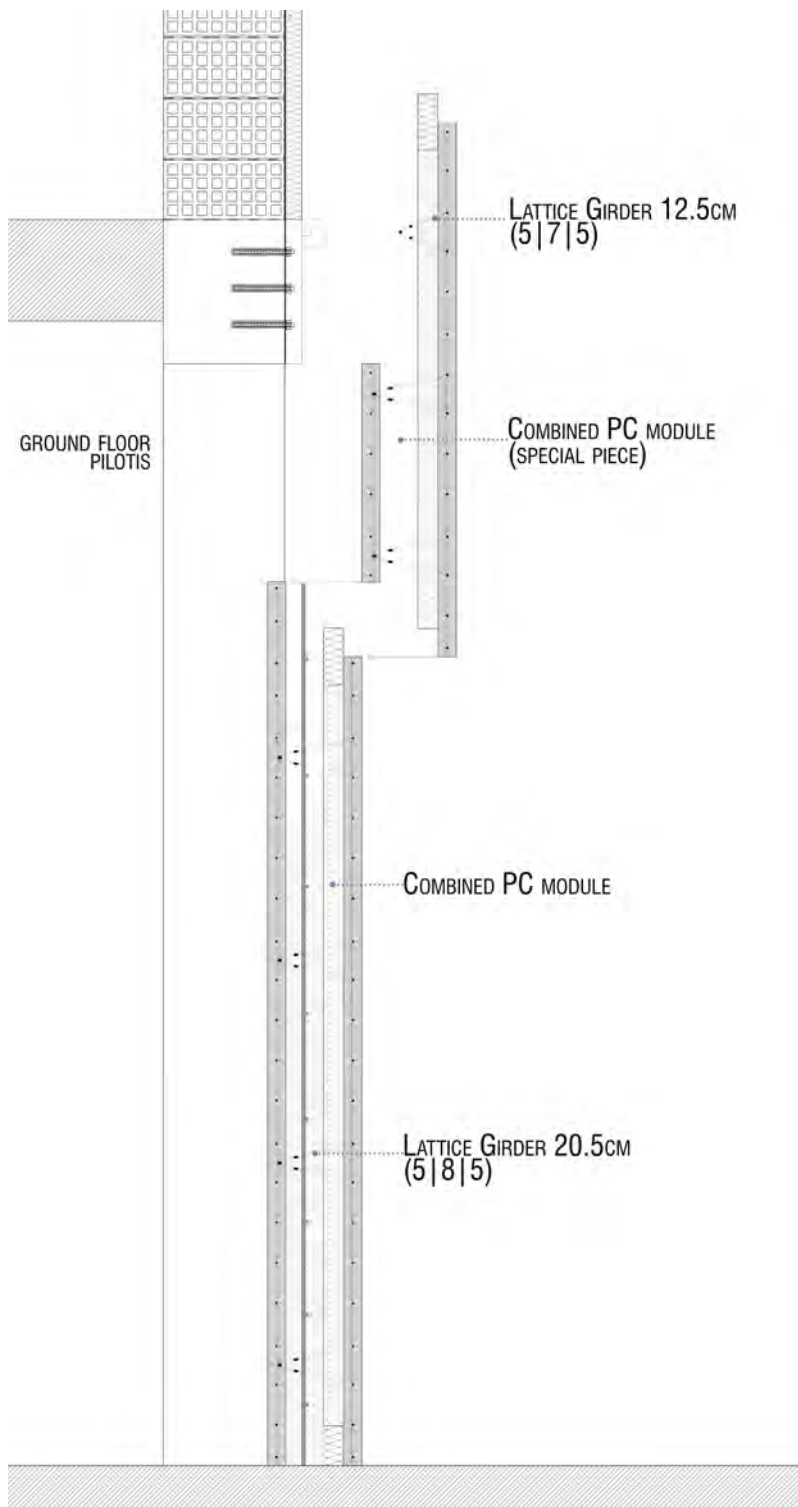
Particular case: Pilotis building. Source: Author
